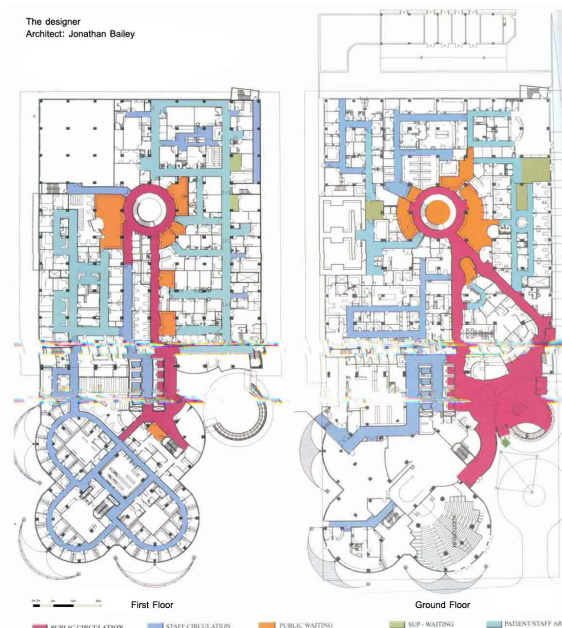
Design Elements of the hospital building at ground and first floors. (TCHP 2002))
